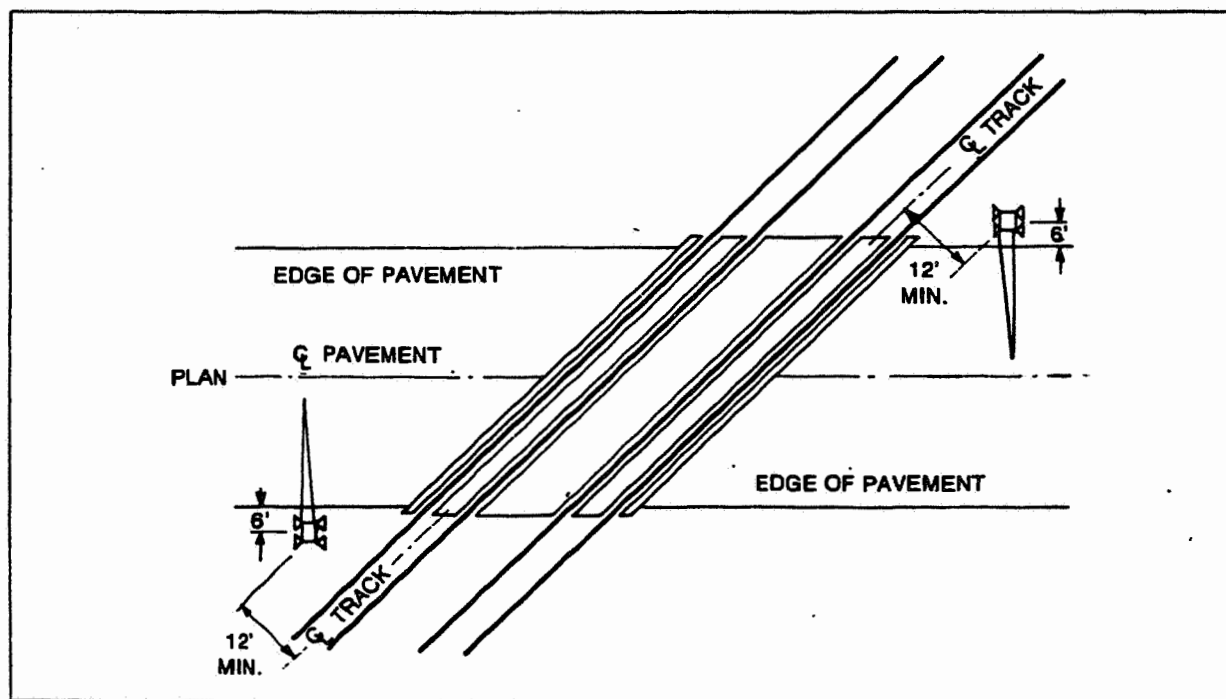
Typical Location Plan for Highway Crossing Signals With or Without Gates for Two-way Highway Traffic (Acute Angle)
